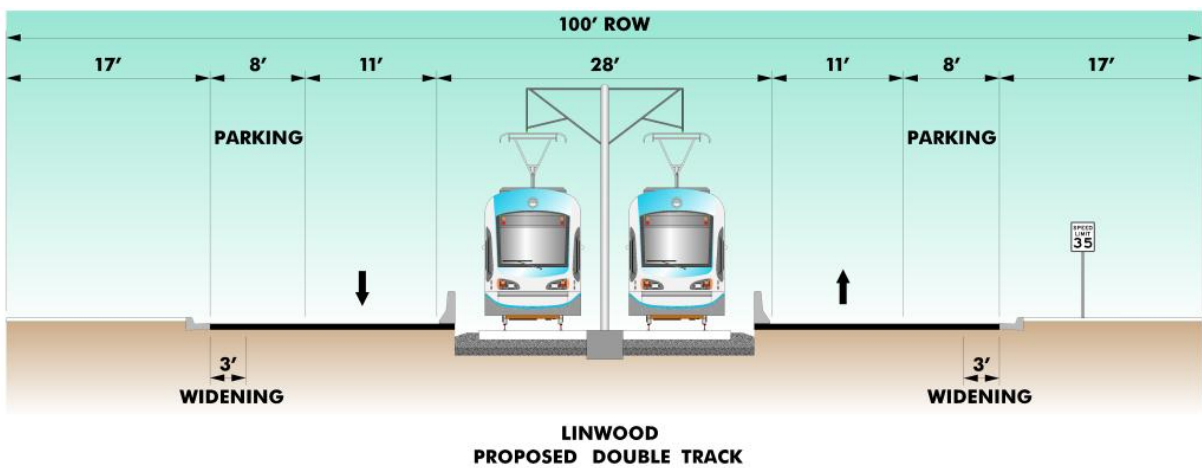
Enhanced Streetcar Linwood Blvd Typical Section
